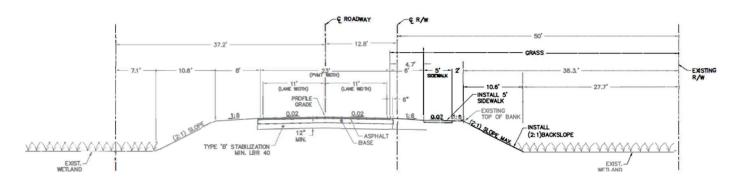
Proposed Sidewalk Improvements
